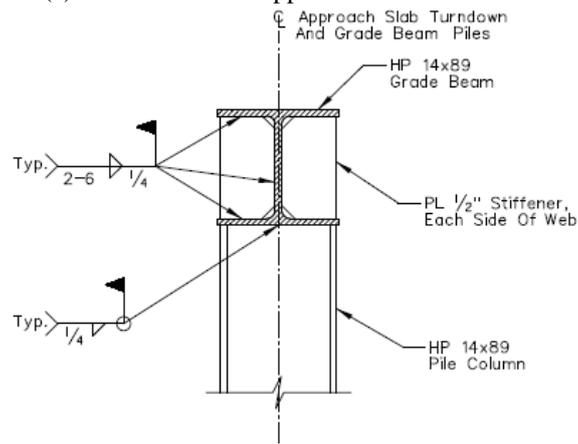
West Mesquite Interchange at I-15 - elevation view
